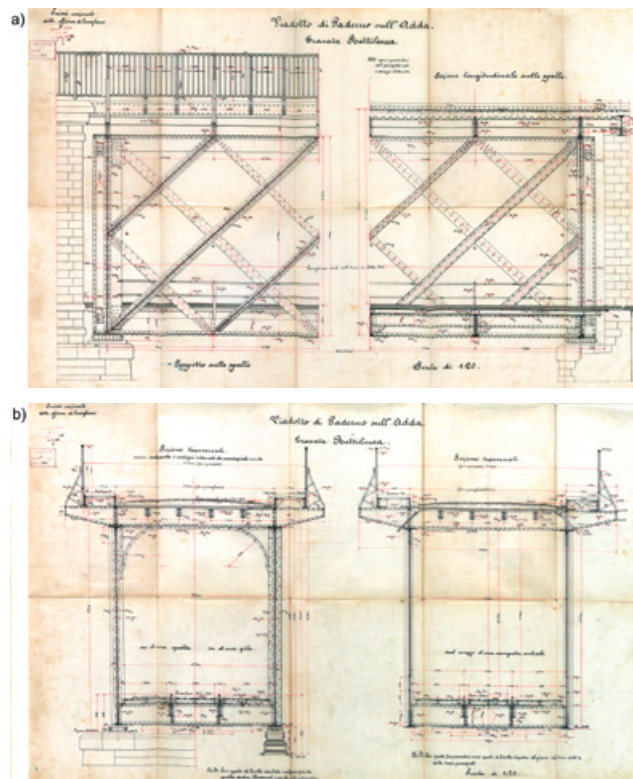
a) Front and longitudinal section of the girder of the Paderno bridge; b) cross-sections (modified scans from State Archive of Turin)
